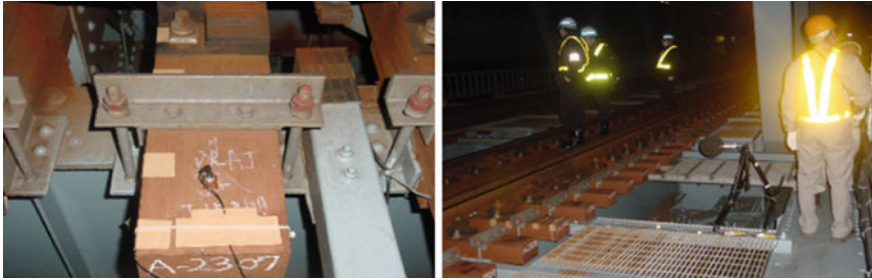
Measurement locations—diagonal chords, truss height, below girders, 12.5 m below girders
